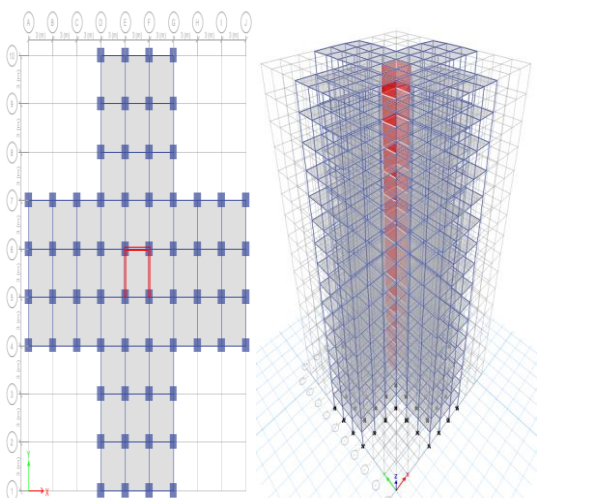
Plan and 3D view of building with shear wall provided at the core (soft storey)
